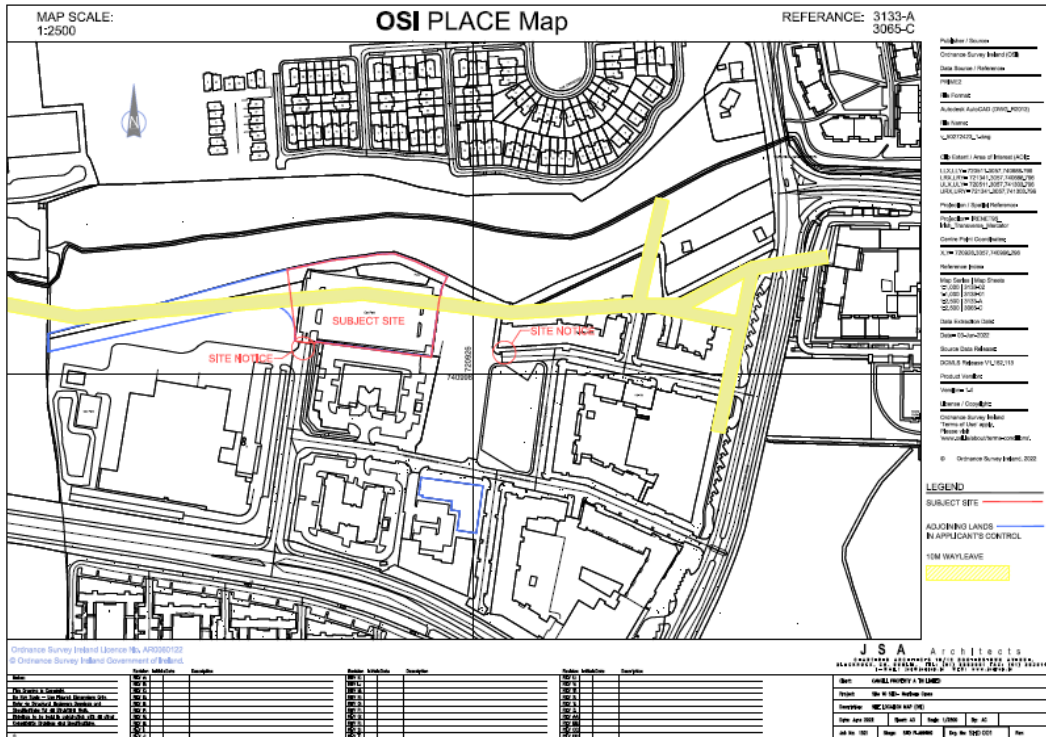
Site Location (OSI, JSA Architects, June 2022)
